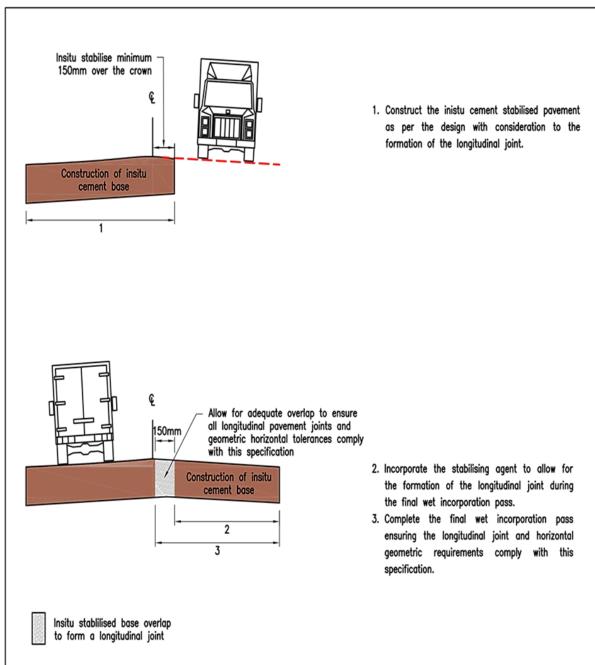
Typical construction process for single insitu stabilised layer
